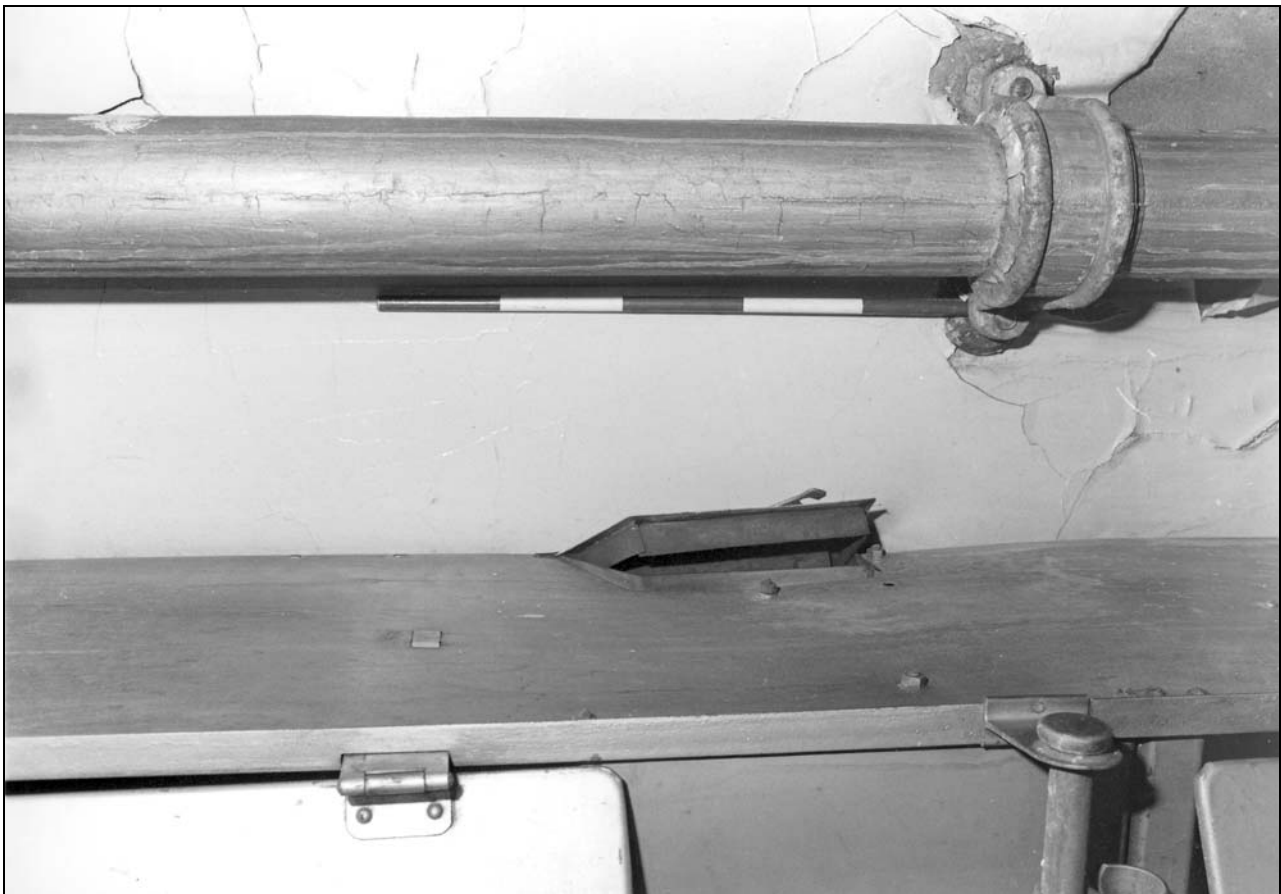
Detail of hinged flap for warm air duct at end of row of “dirty” lockers (film 4, frame 13)
